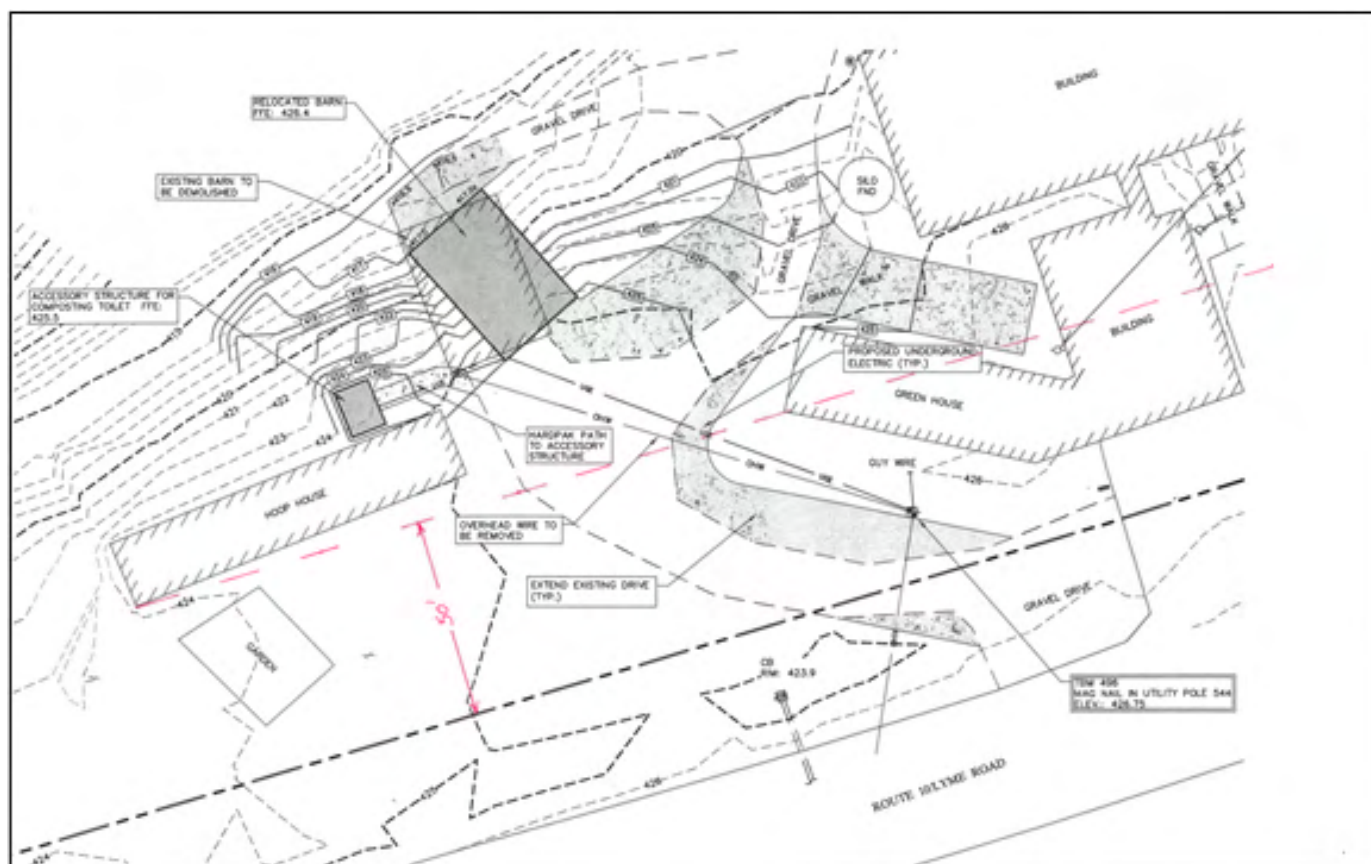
Enlarged version of above site plan from 2013 for installing the O-Farm sign. Depicts the Organic Farm Front Yard Setback (in red) with 1" = 20. ("Overall site plan for Dartmouth College," 2012).
